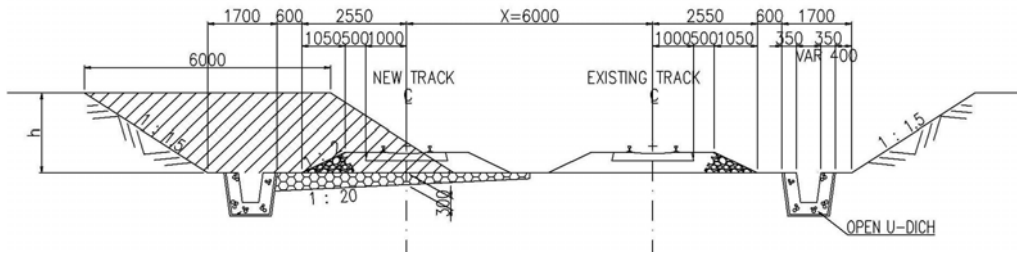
Standard Drawing of Double-track Section with Embankment
